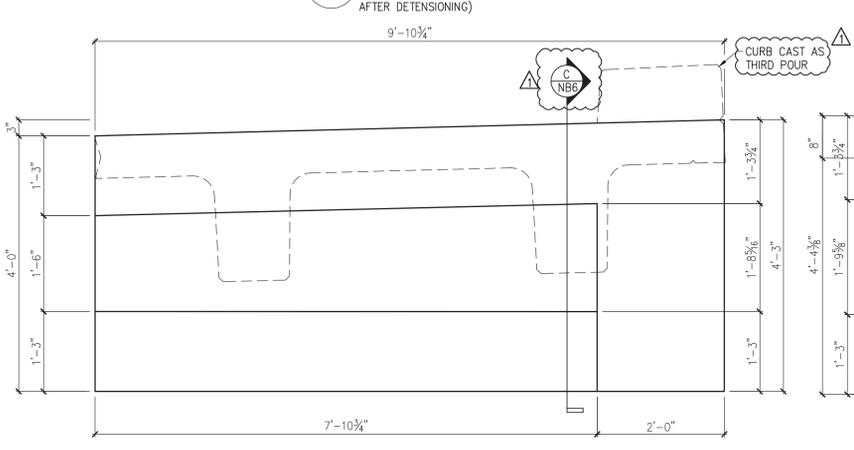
DETAIL 'A' - END OF NEXT BEAM (TYP.) (PRIOR TO CASTING CURTAIN WALL) 3/4" = 1'-0"
